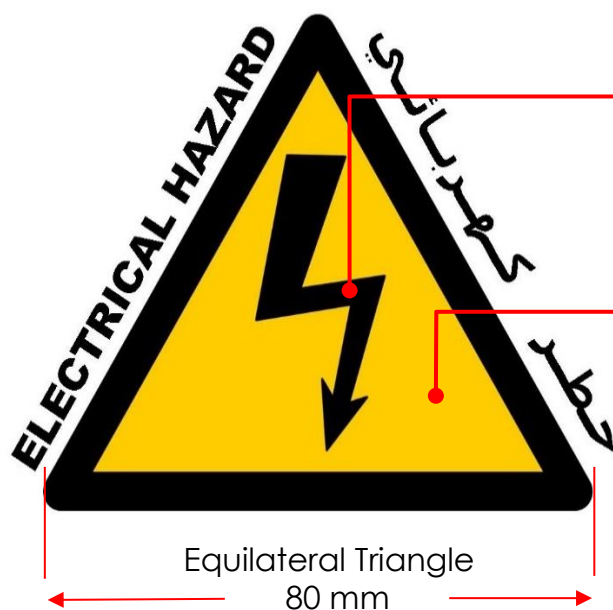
Details of Anti-Tampering Warning Note for Meterboxes with Steel Enclosure
